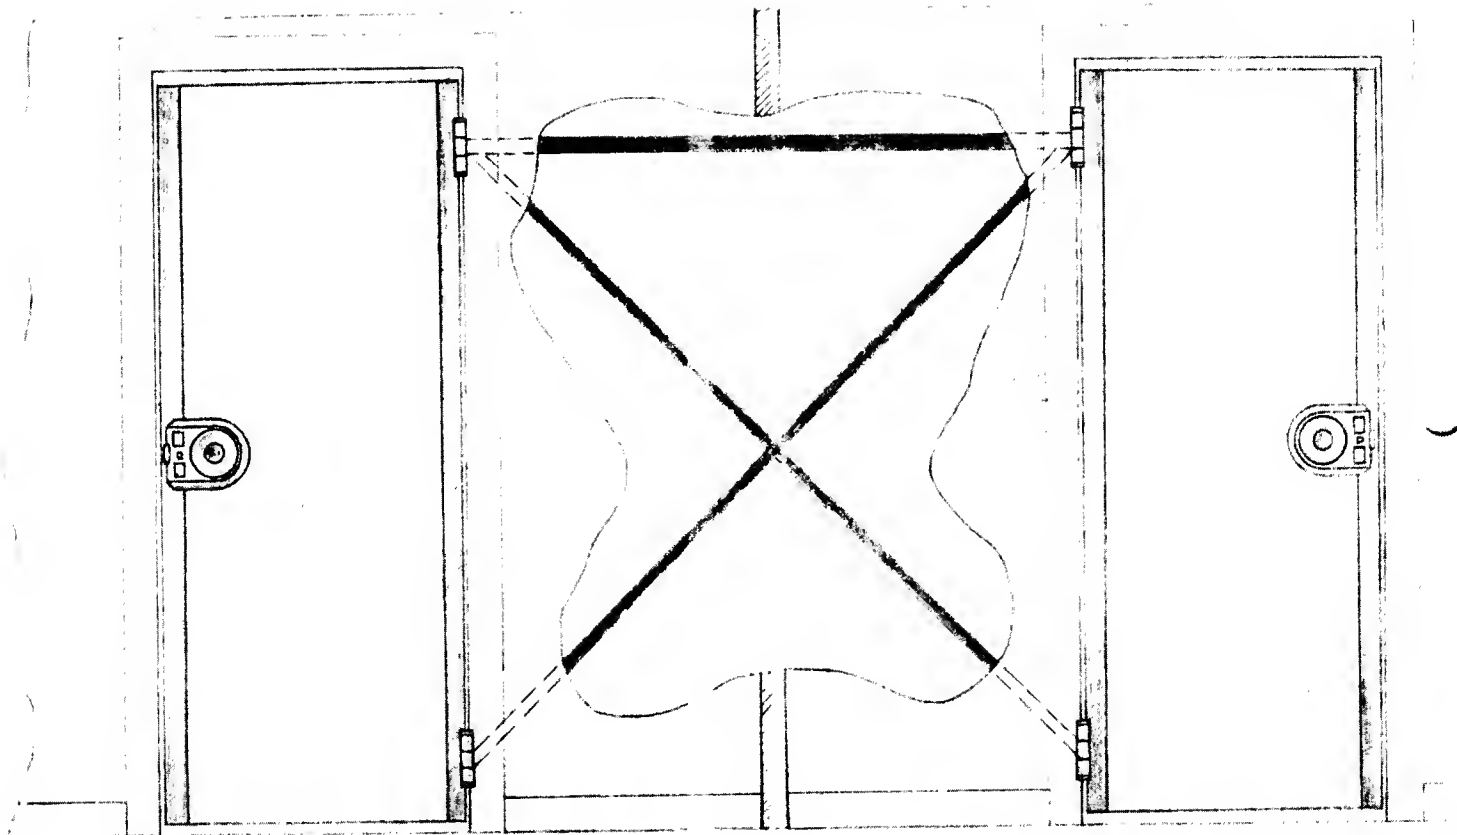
San Francisco Hilton Wall Bracing Scheme for Use on "Valet Door" Floors
